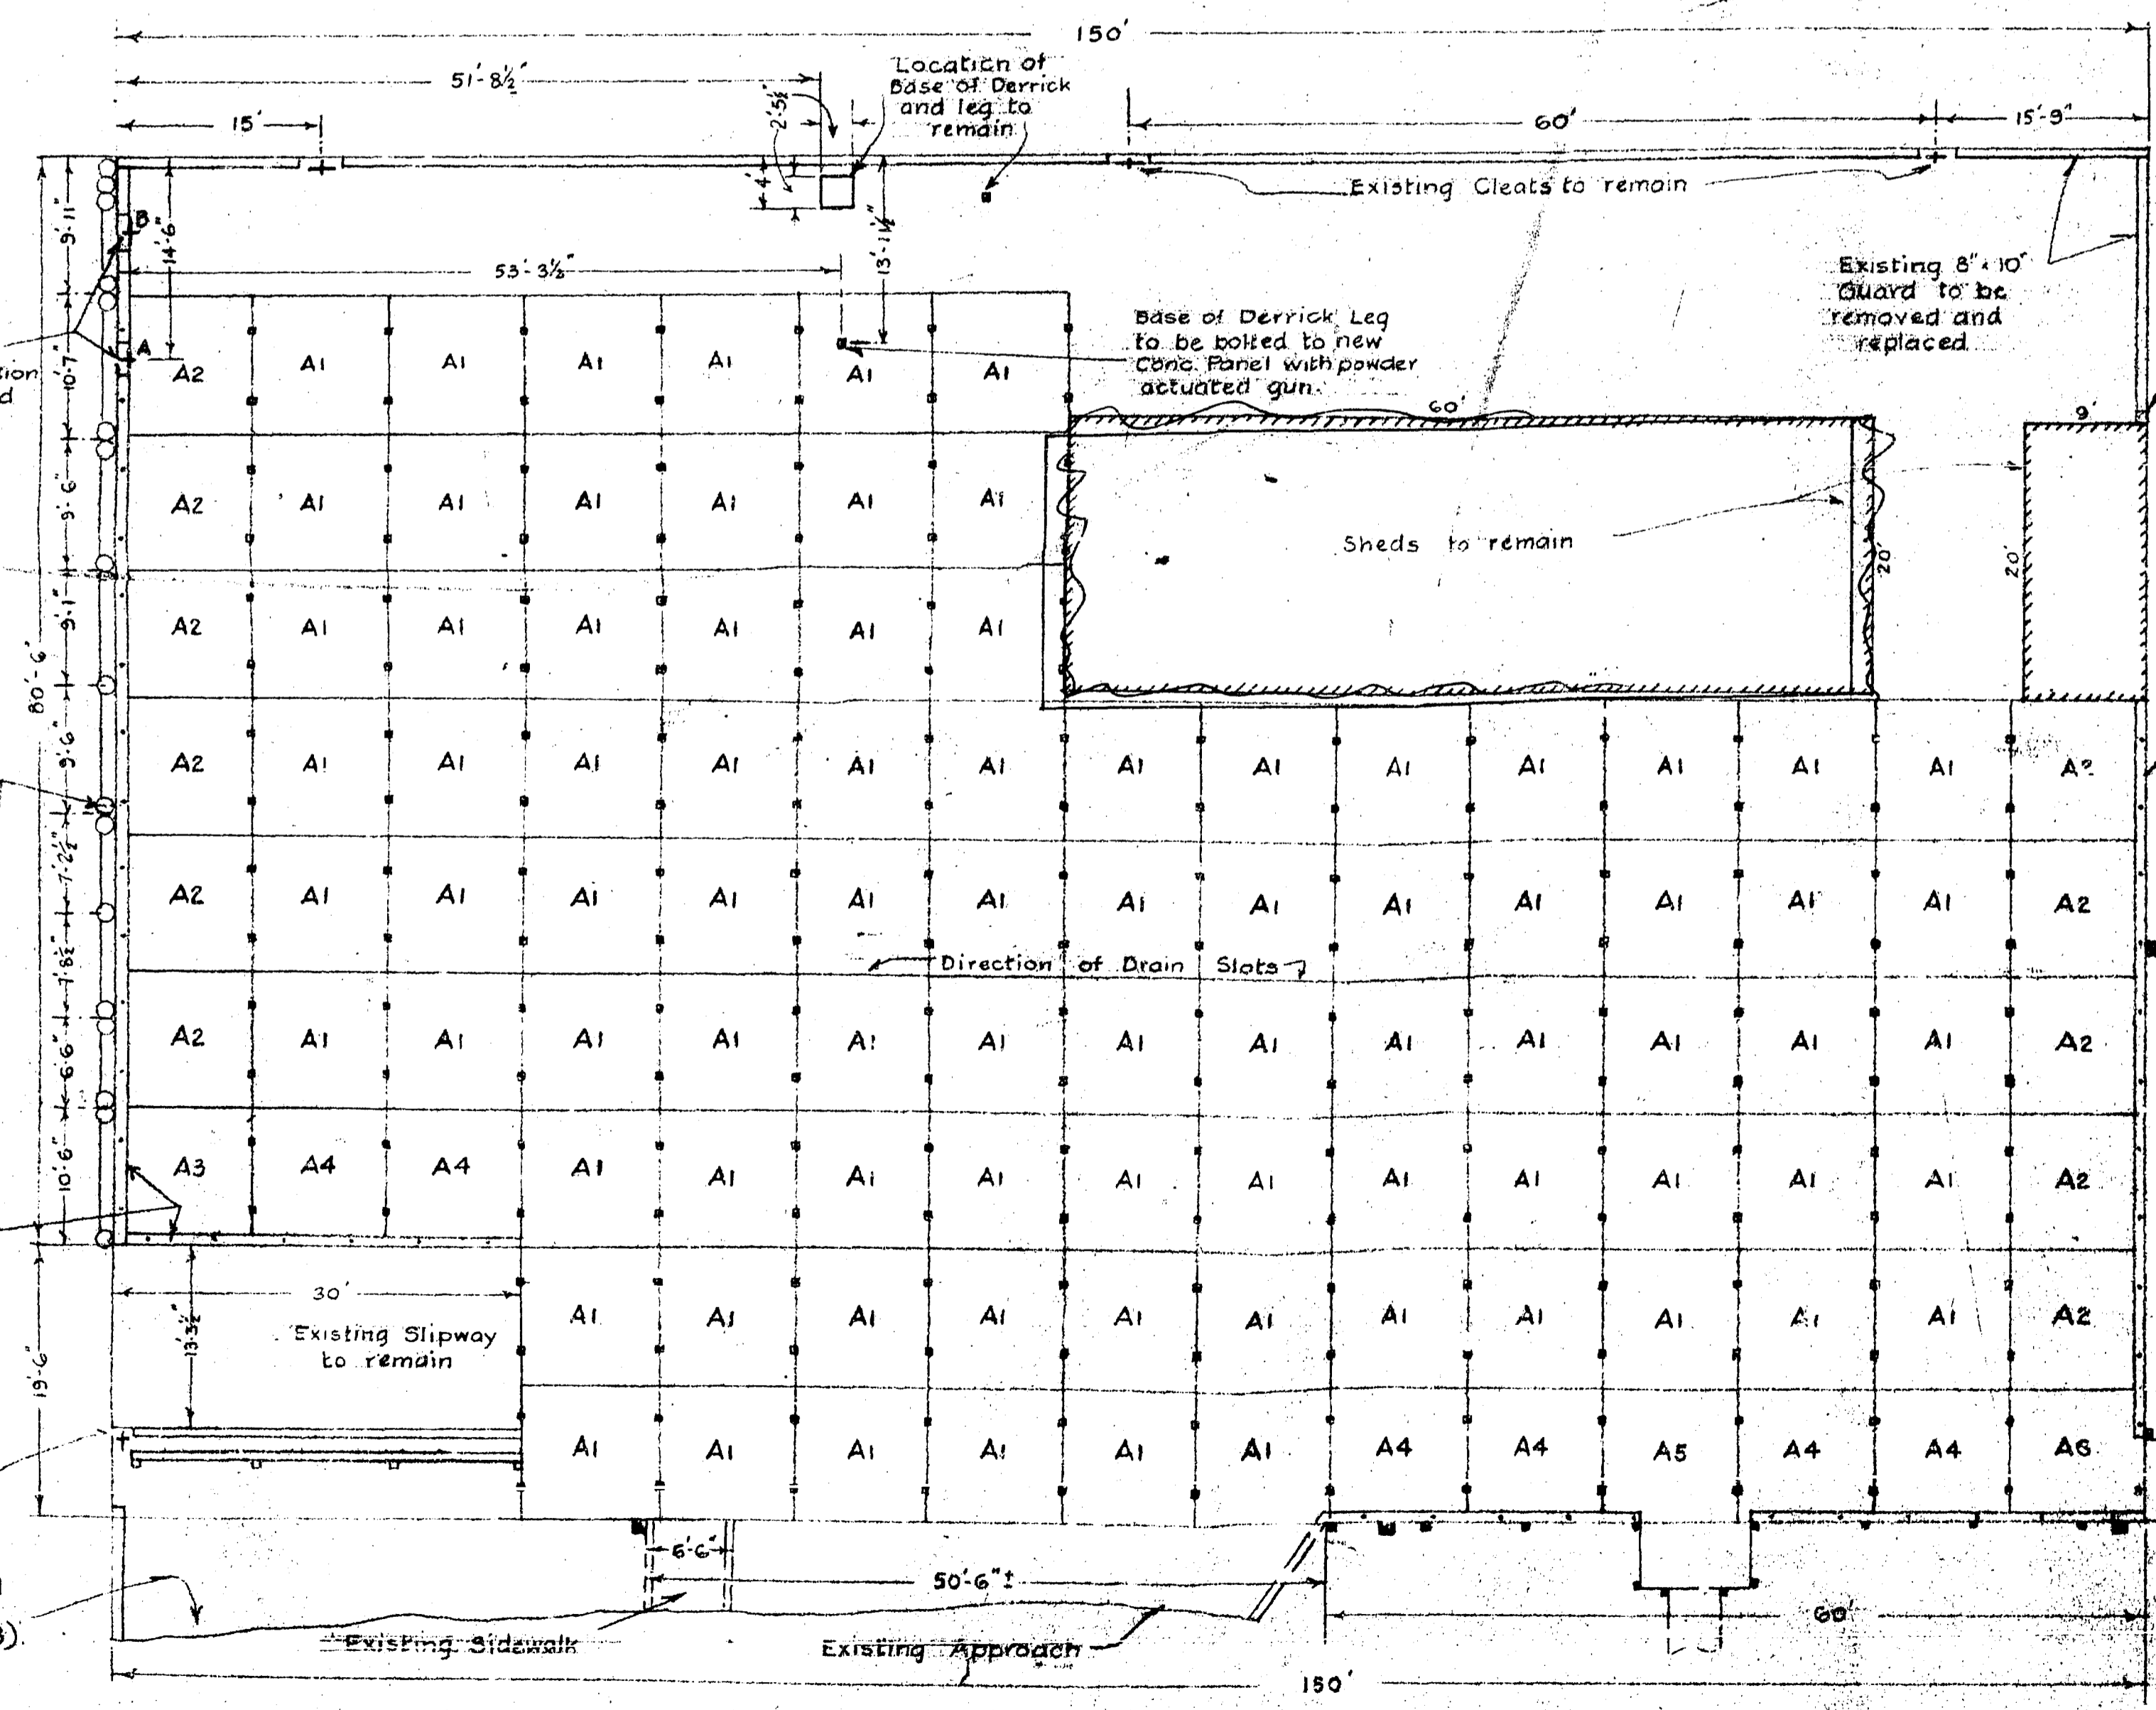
PLAN OF WHARFHEAD DECK SHOWING PANELS
